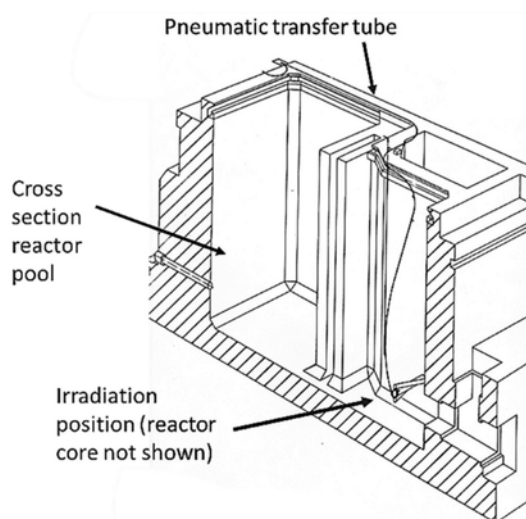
Example of pneumatic transfer system with S-shaped bend in in-pool part at reactor Institute Delft (courtesy of P. Bode, TU Delft).
